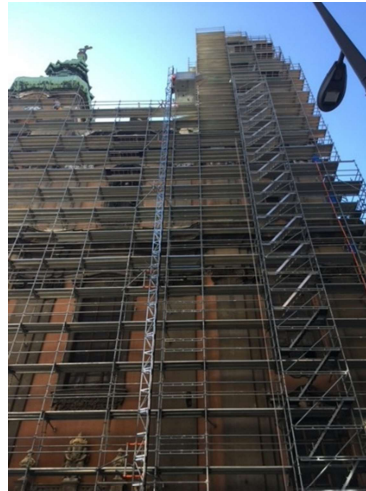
Example of frame façade scaffolding. Source: own University Square church)
